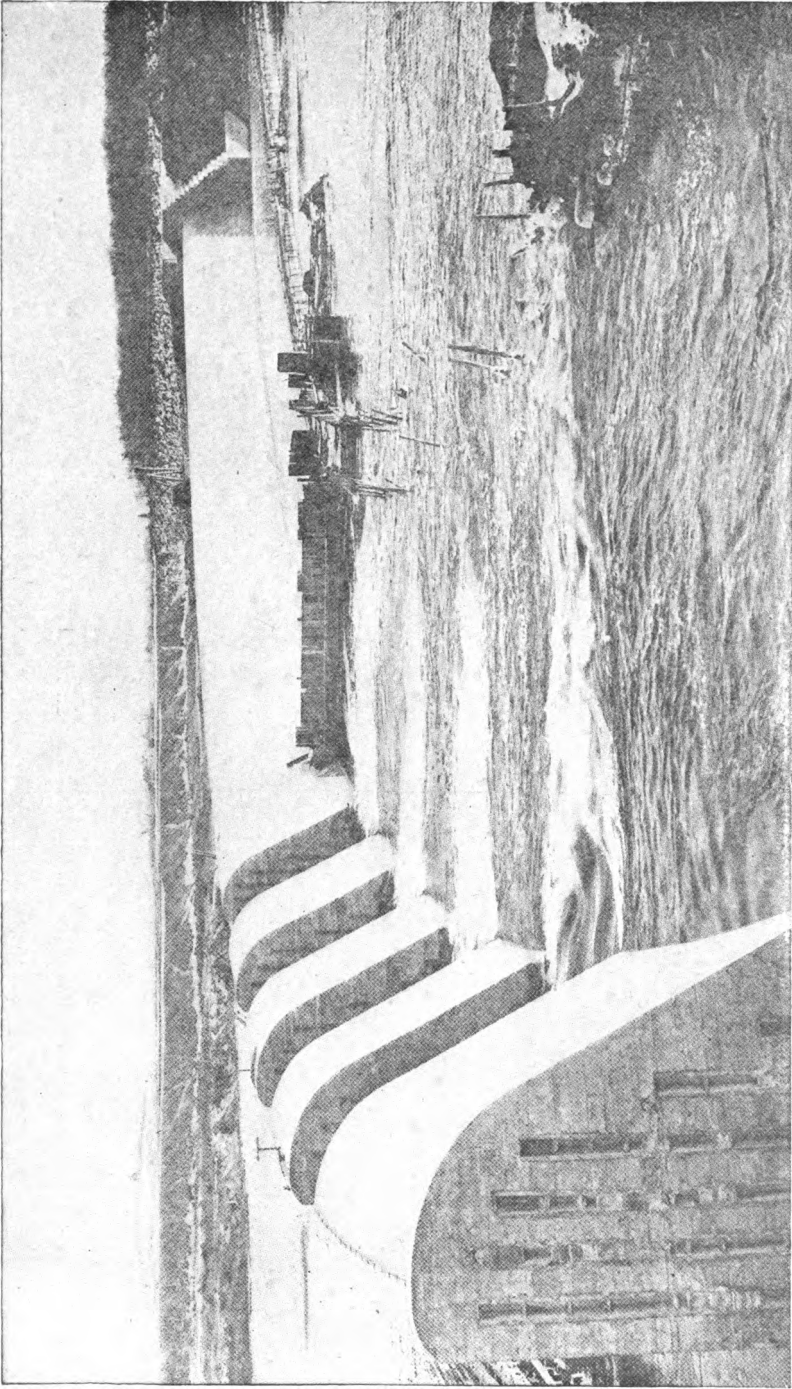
For Dams, Piers, Bridges and Such Heavy Work Concrete is Away Ahead of any Other Known Material. It must be also added that in this heavy engineering work it is always, under the superintendence of most skillful and careful engineers and is designed by masters in the science; on the other hand concrete buildings are generally erected by haphazard design and most often entrusted to very ordinary builders, simply because they will do it for less money than the other man. It is small wonder that there has been so much trouble with it.
